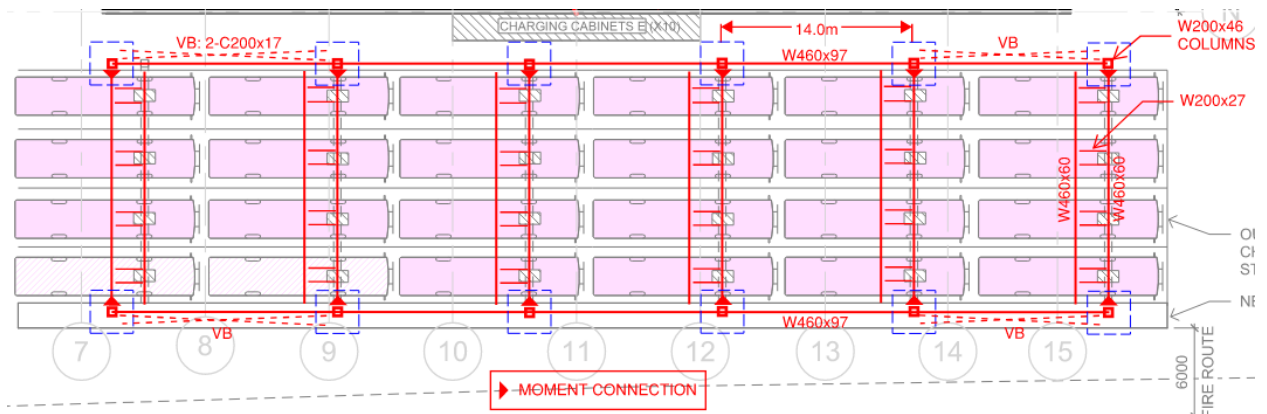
Gantry Framing Plan – Structural Support for Exterior Pantographs.
